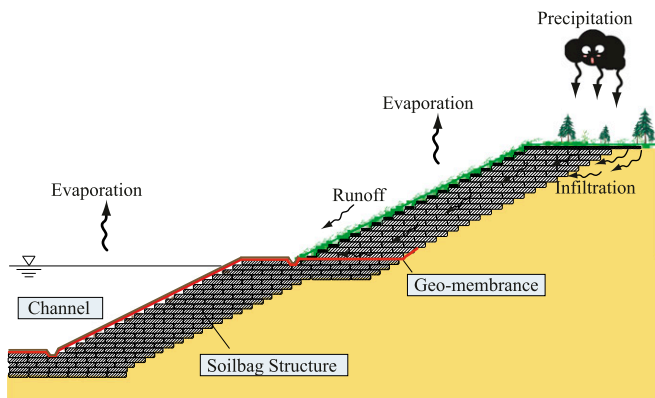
Illustration of stabilizing expansive soil slope with soilbags
